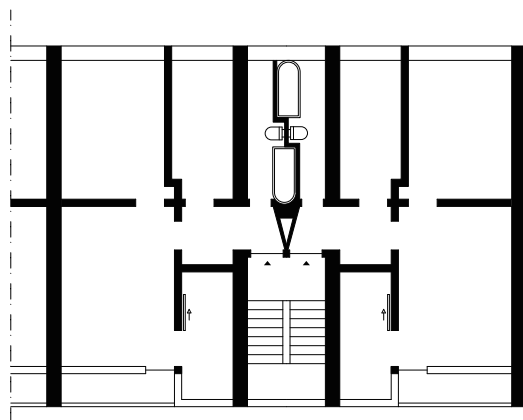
Plan, Siedlung Hellerhof - 1:200
